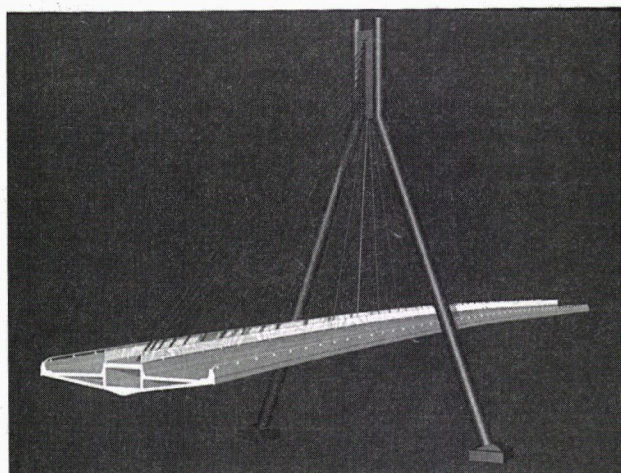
Schematic of Gilman/I-5 cable-stayed bridge.
